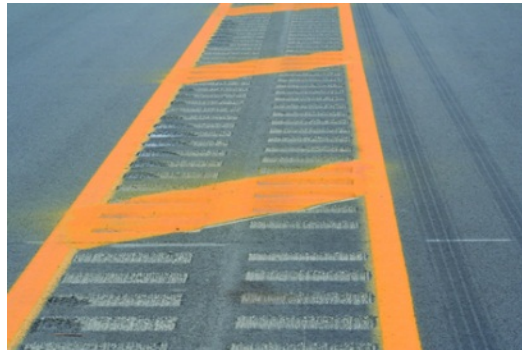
Photo. Barrier type 11—median strip.⁽²²⁾
